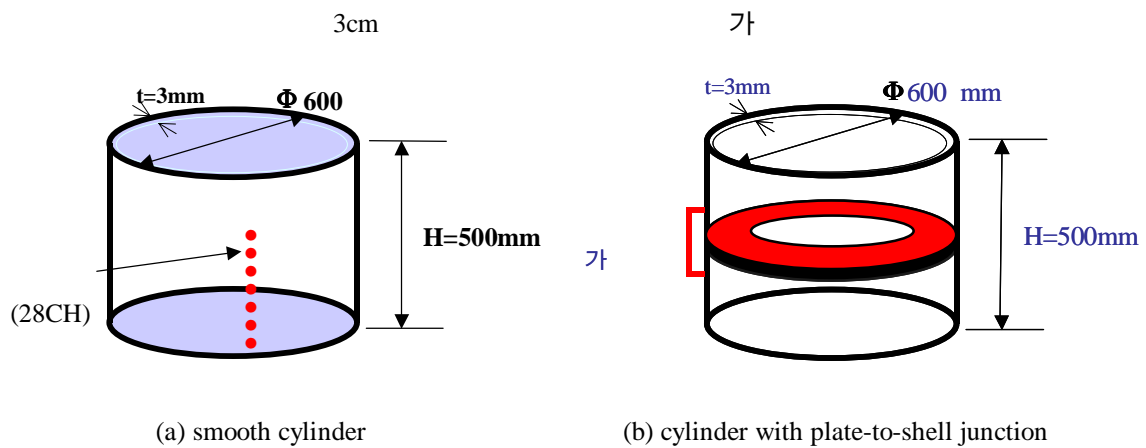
Dimensions of smooth test cylinder and cylinder with plate-to-shell junction
